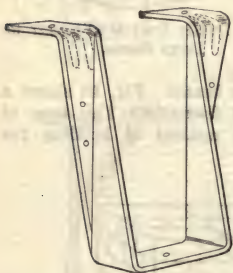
"Ideal" Wrought-steel Beam-hanger
